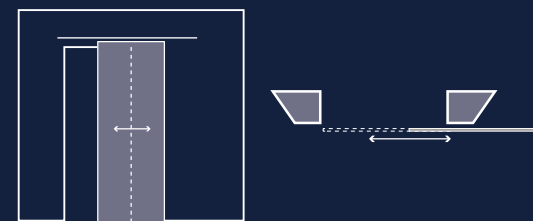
DETAILS OF VITRA EXTERNAL WALL SLIDING DOOR ABSOLUTE
